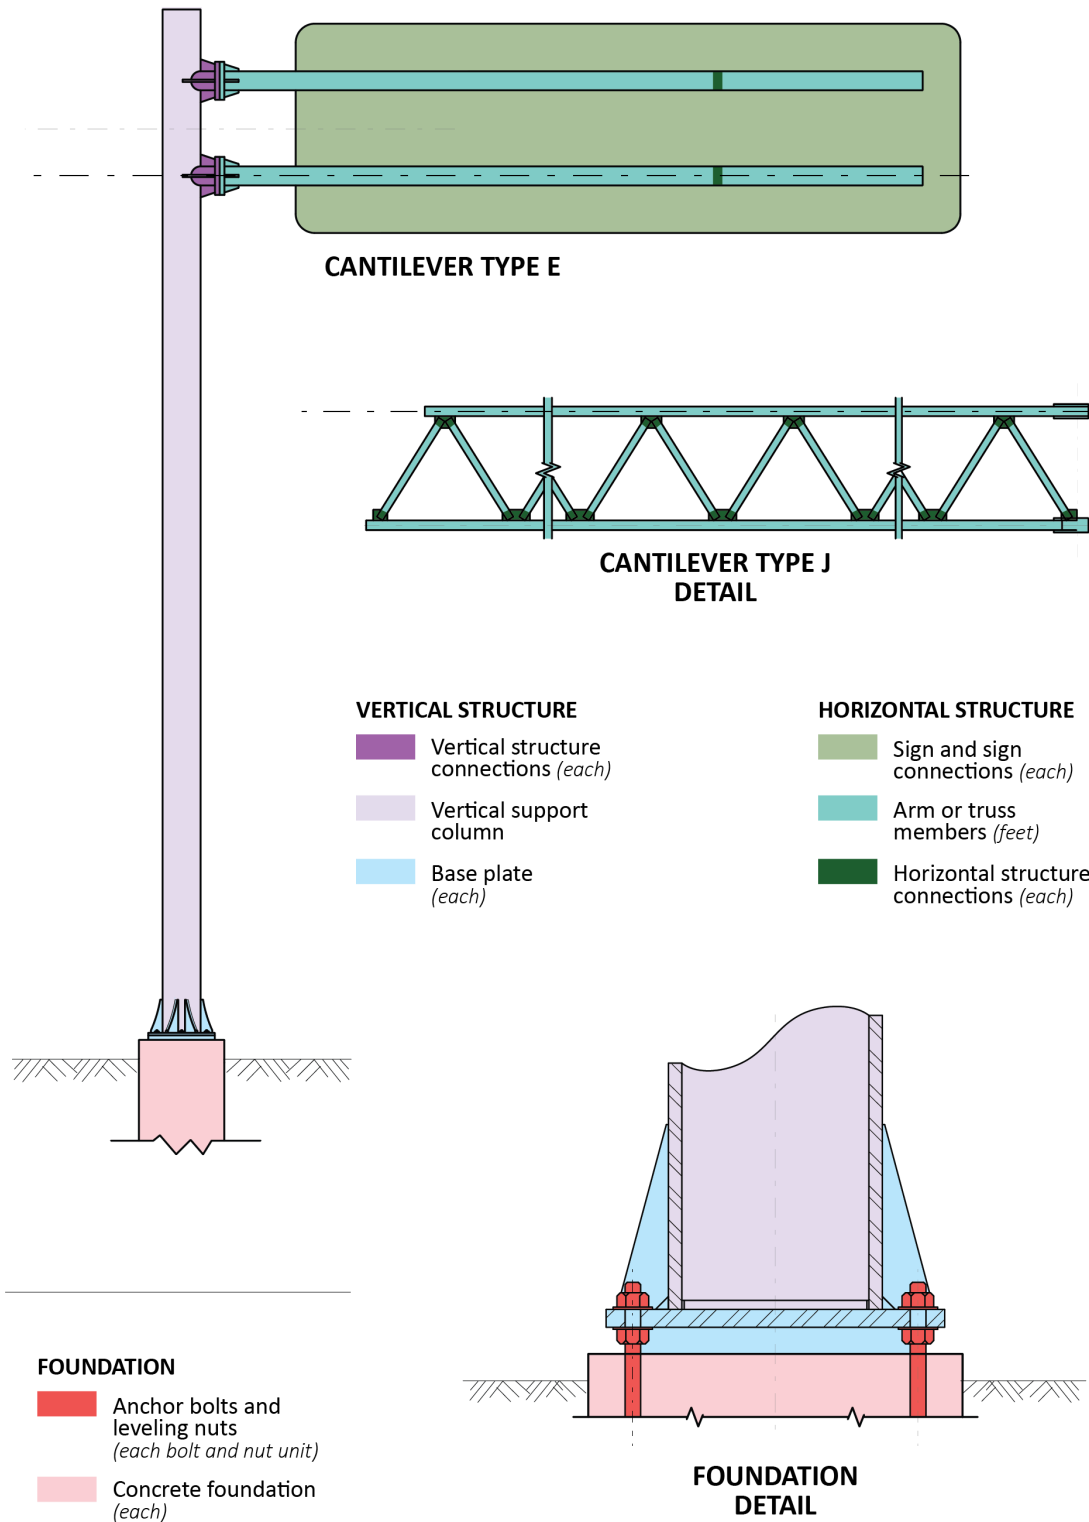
Elements and components for Cantilever Structures and Truss Structures (adapted from MDOT Standards SIGN-300-C, SIGN-340-B, SIGN-370B)
